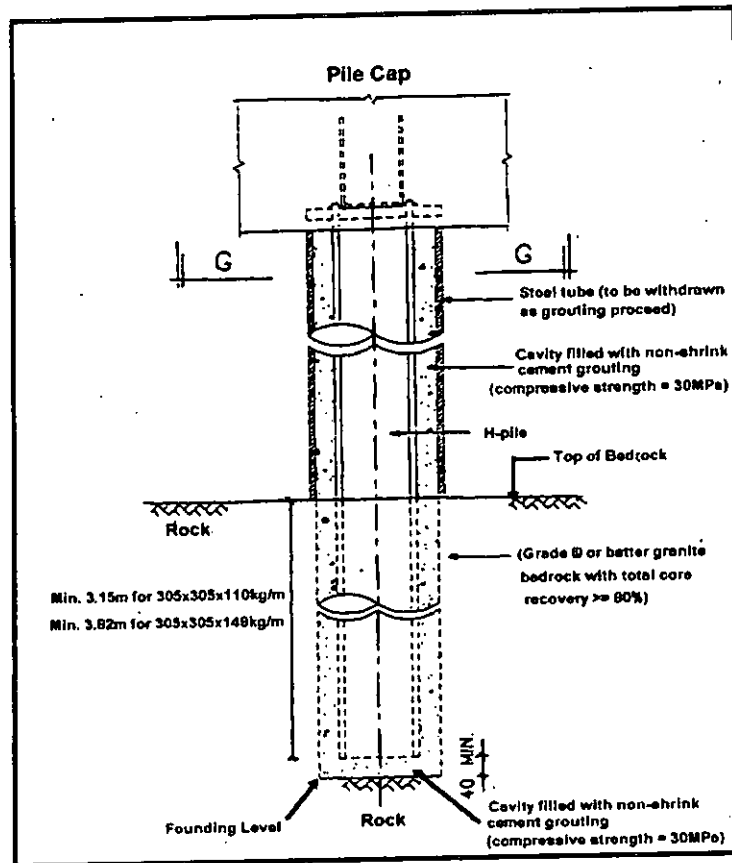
Schematic drawing of a concrete pile reinforced with an H beam
